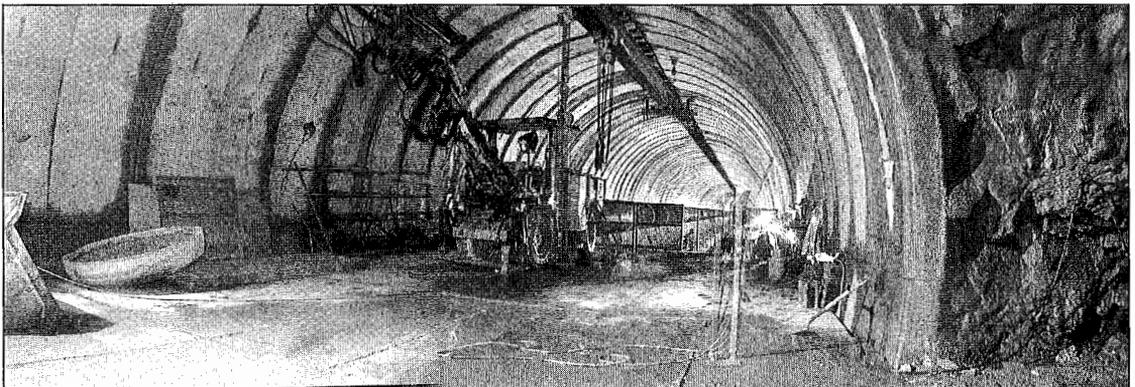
Typical work deck installation, with the adit portal visible at right.
